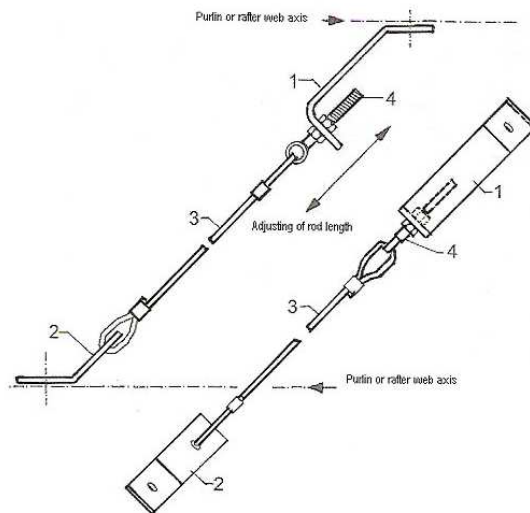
Rod bracing of purlins or wall girts in Sadeif system: 1- clip, 2- gusset plate, 3- rod, 4- tapped bar
